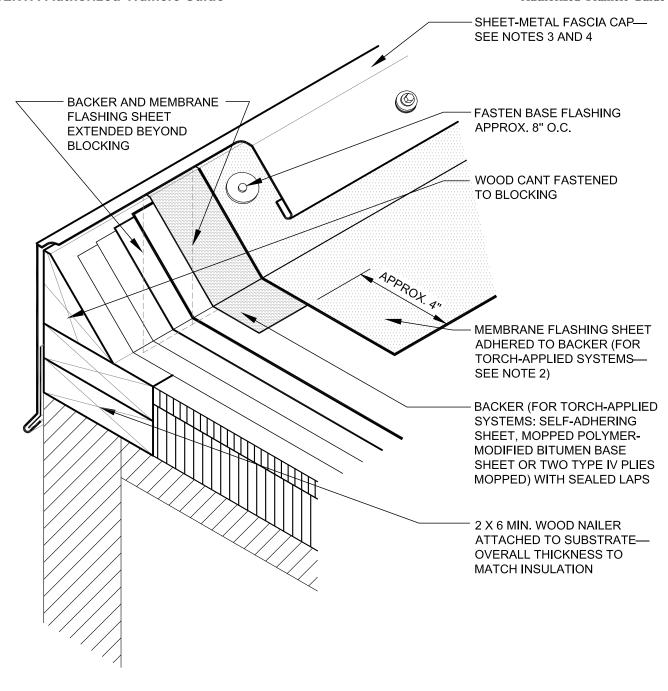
BUR~and~polymer-modified~bitumen~roof~membrane~outside~corner~flashing~application~(continued)
